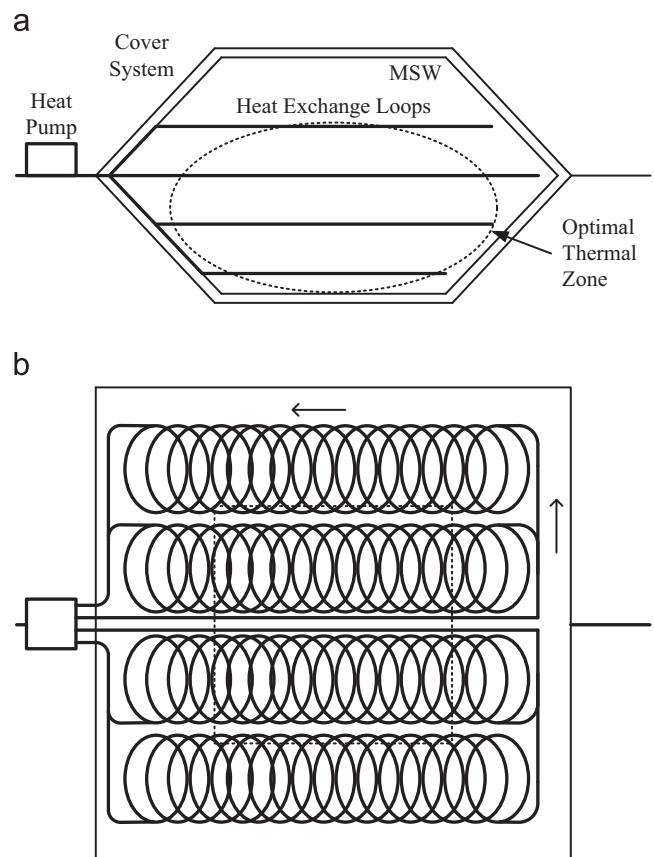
Horizontal “slinky” geothermal heat exchanger configuration for closed landfills: (a) Elevation section of vertical configuration; (b) Plan view of vertical configuration.
